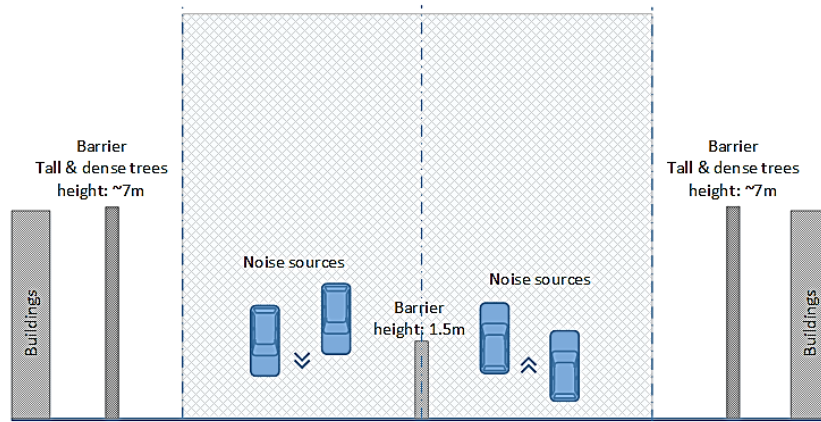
Schematic diagram of recommended barriers scenario for the Second Ring Road.
